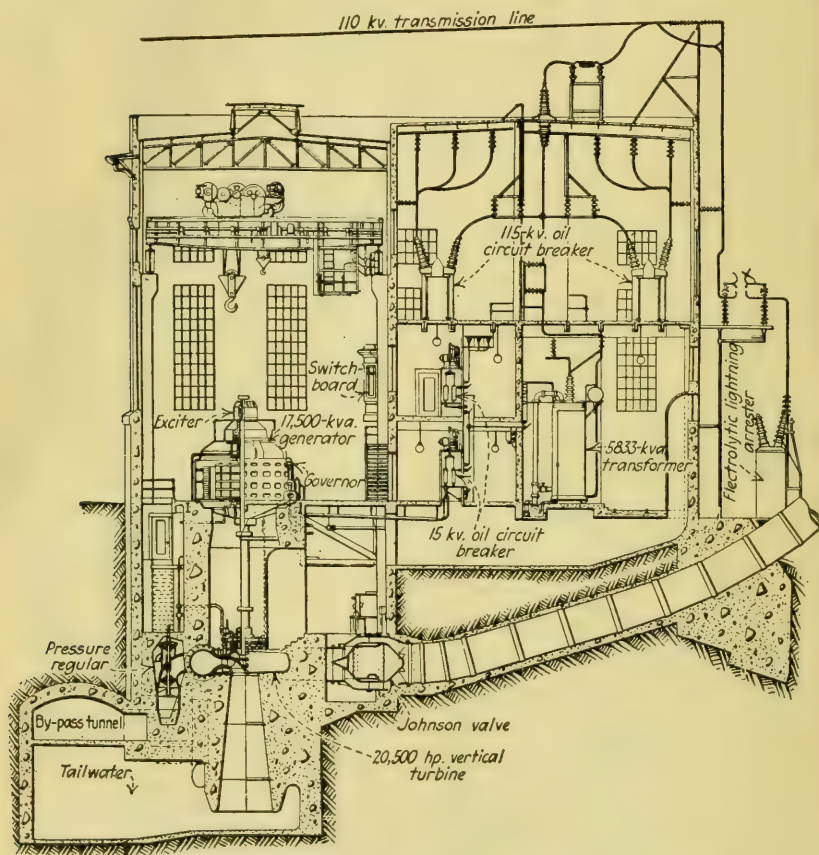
Cross-section Station No. 2, Los Angeles, Aqueduct System.
